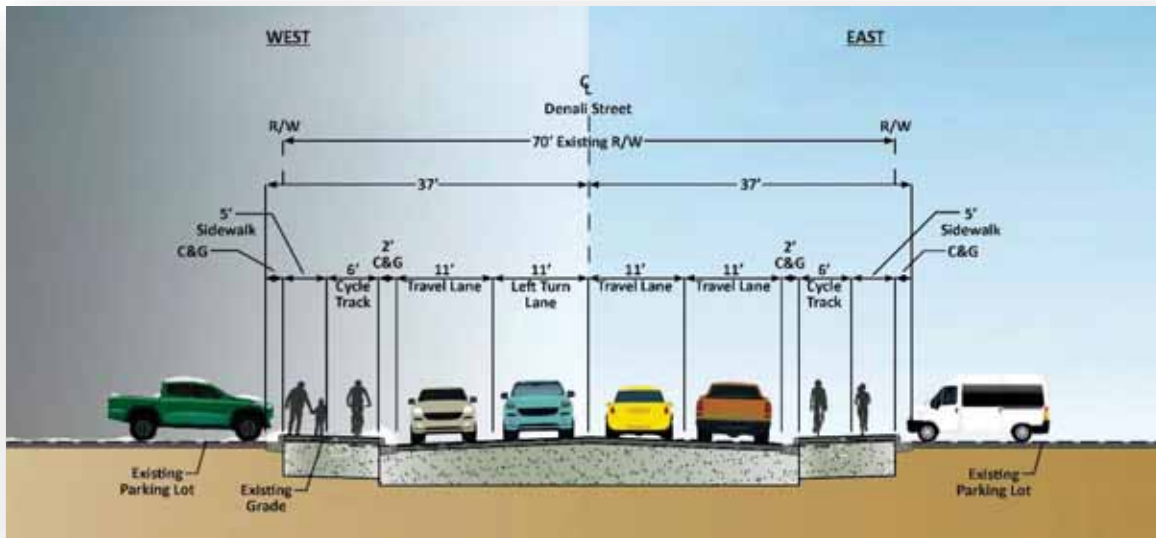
Denali Street (Benson Boulevard to Northern Lights Boulevard) – Alternative 2
